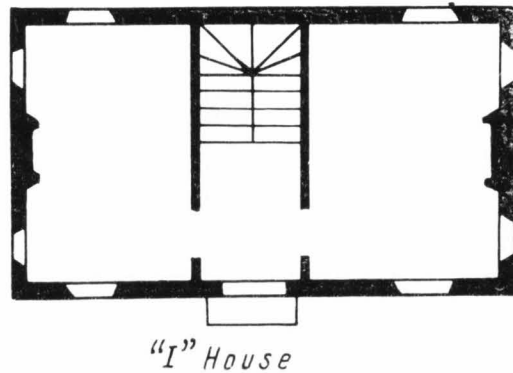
Floor plan of "I" house. (After Richard Francaviglia, *Mormon Central-Hall Houses*, 1971)
